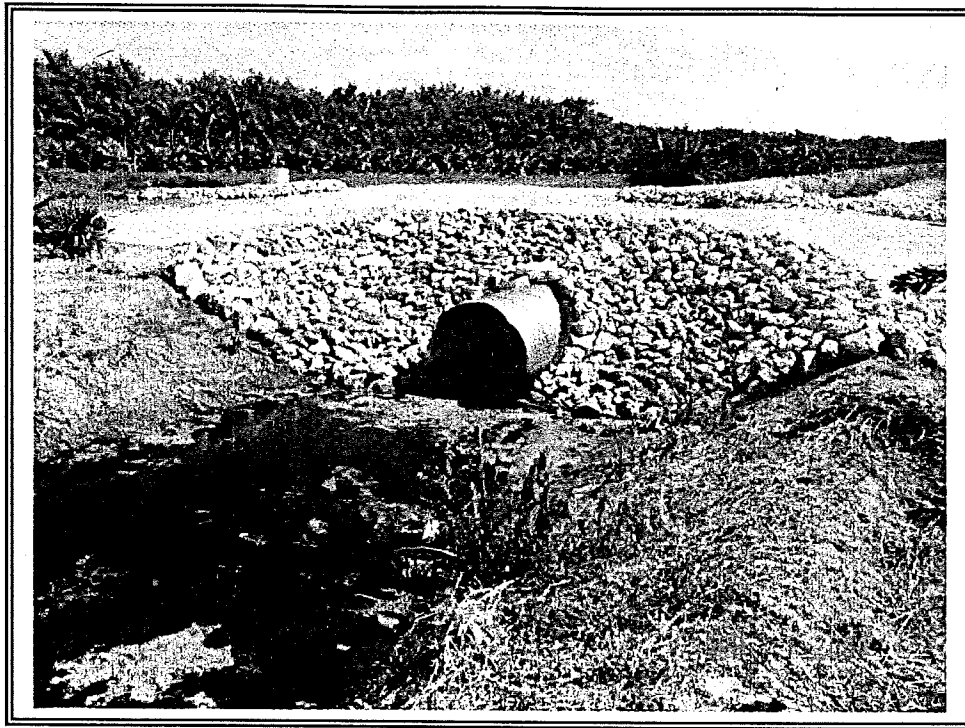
Photograph of corrugated metal pipe and armor wall supporting the internal farm road.
